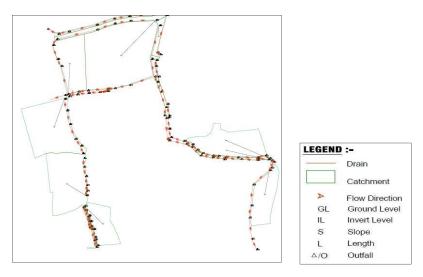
Storm water drainage on the considered road 23, 26 & 27
